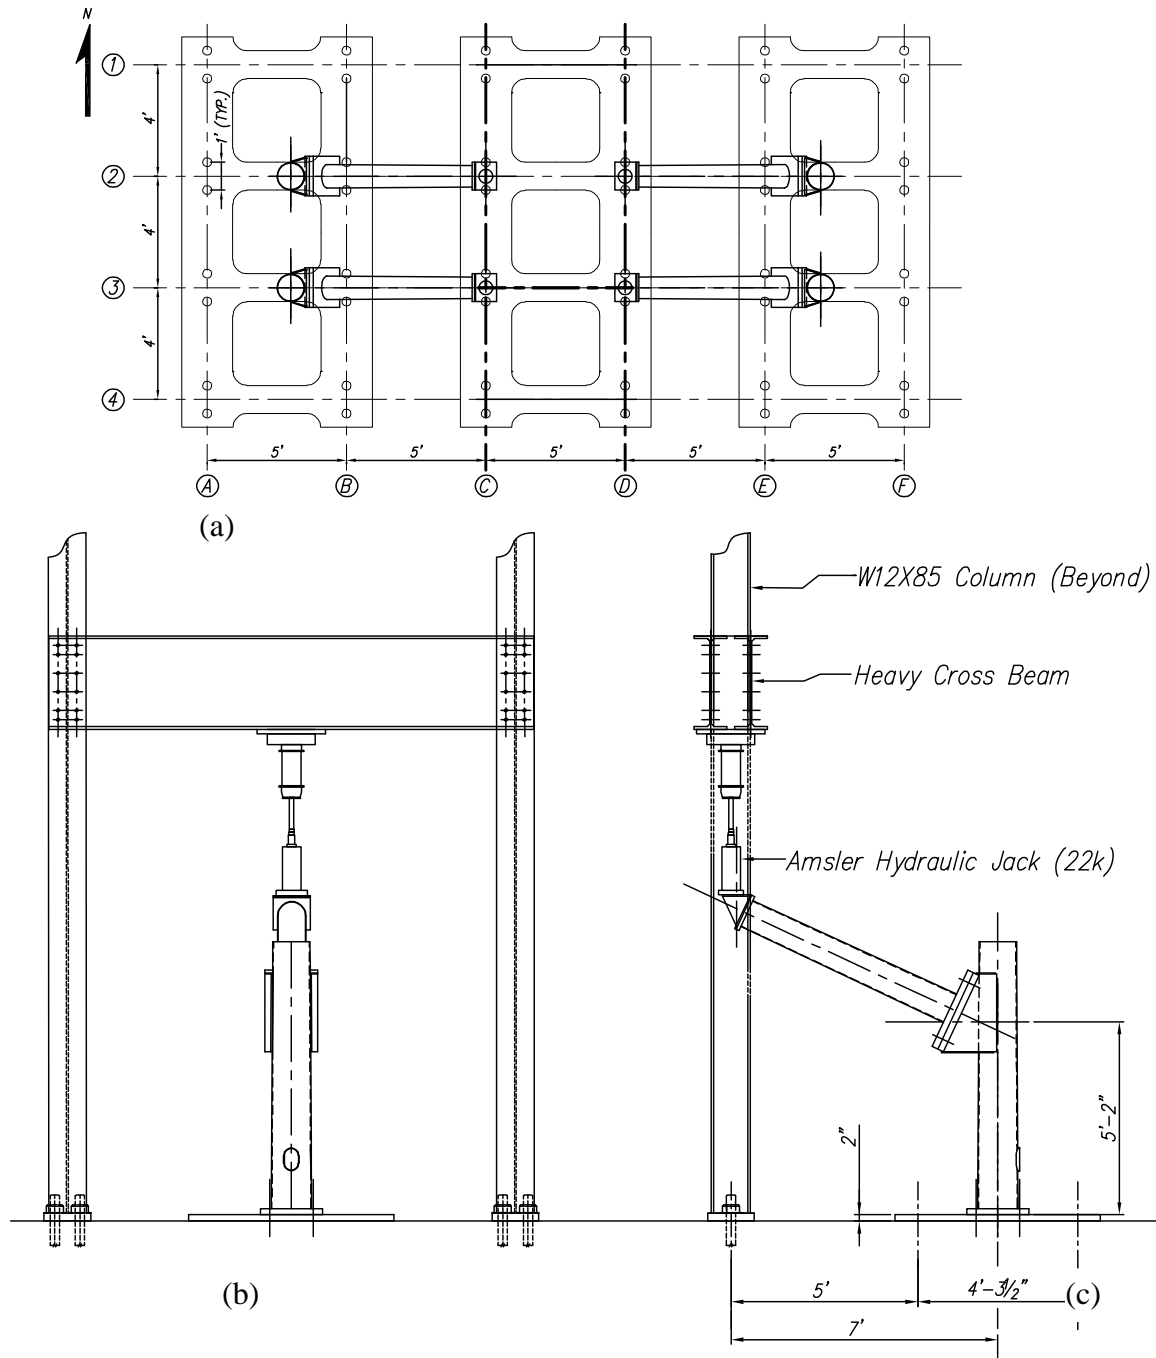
Schematic of test setups at Fritz Laboratory: (a) Plan; (b) Front Elevation; (c) Side Elevation
